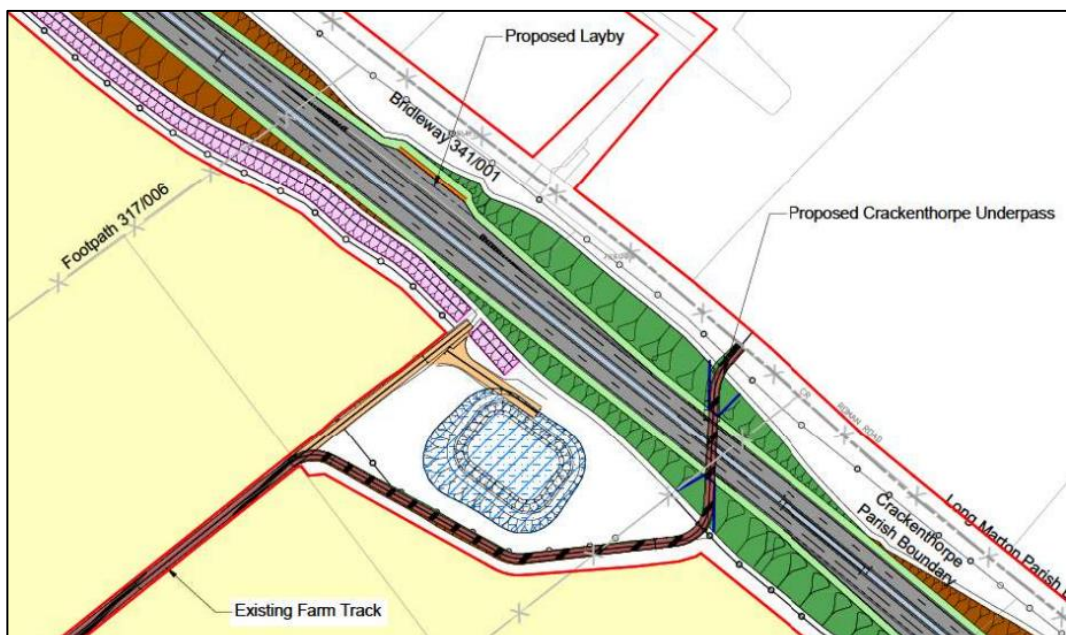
(a) Extract from General Arrangement Drawing (Before)
